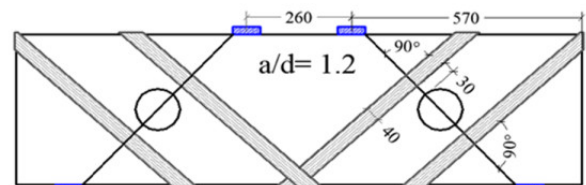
Details of strengthened deep beam with openings (DO-1.2-I)
